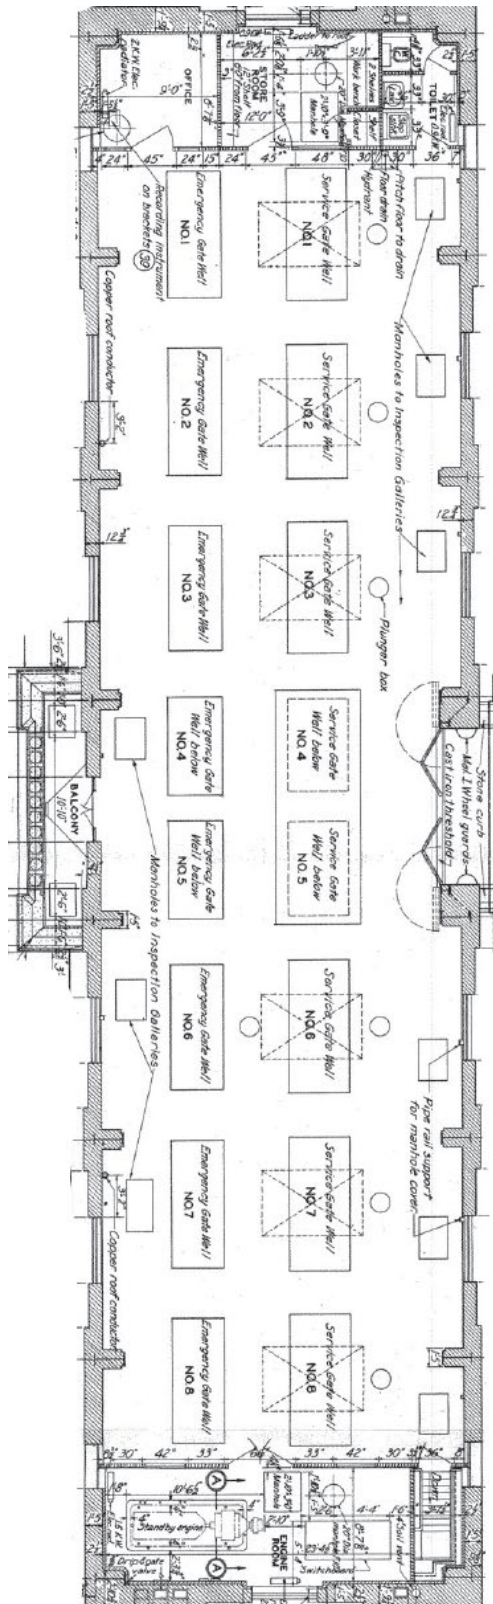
Exhibit D: As Built Drawing [Not to Scale]. Operating Floor plan and layout.
